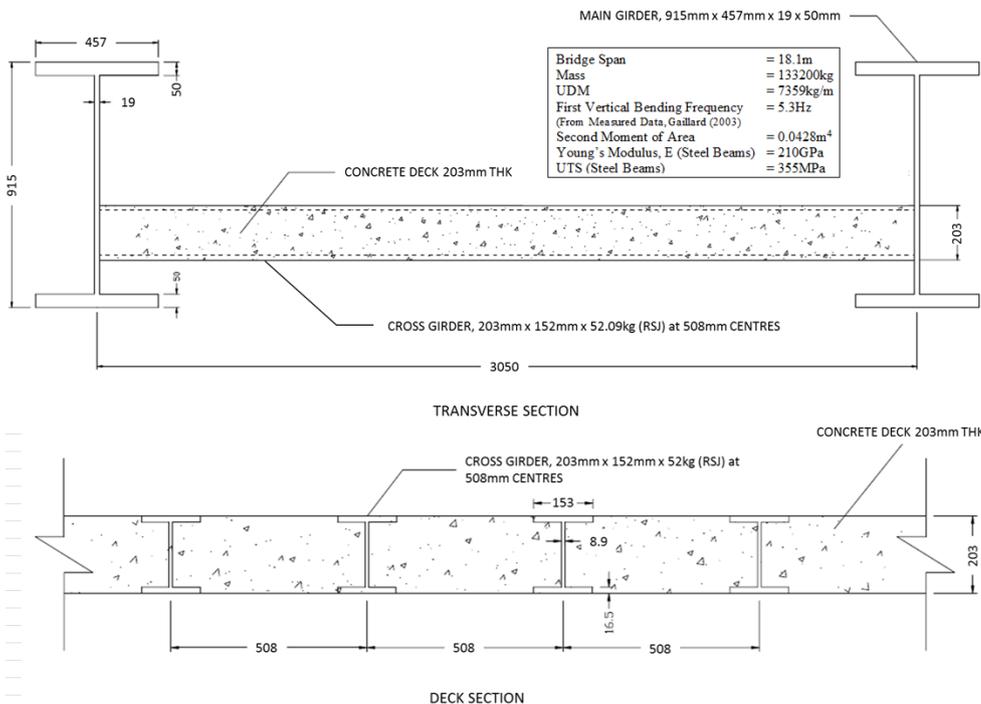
Half-through deck plate girder railway bridge used as case study (Gaillard, 2003).
